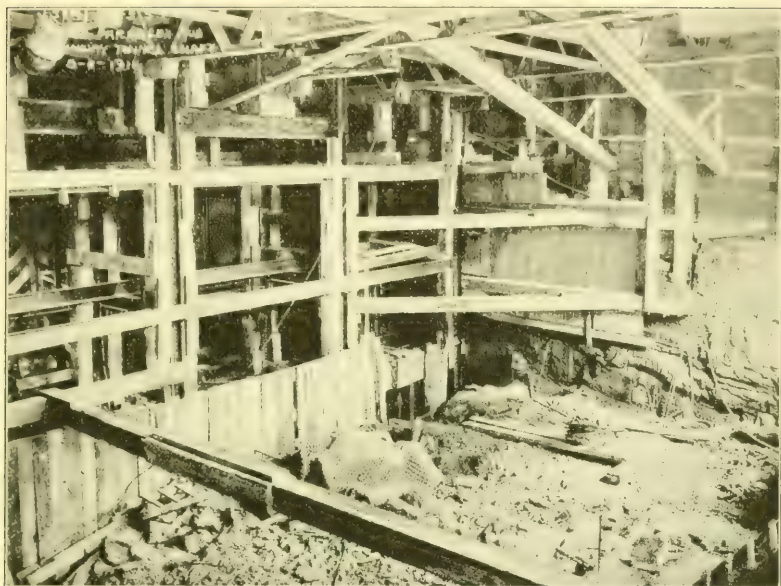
EXCAVATION FOR SOUTH SIDE OF ELEVATOR SHAFT COMPLETED TO GRADE OF ENGINE-ROOM FLOOR.
